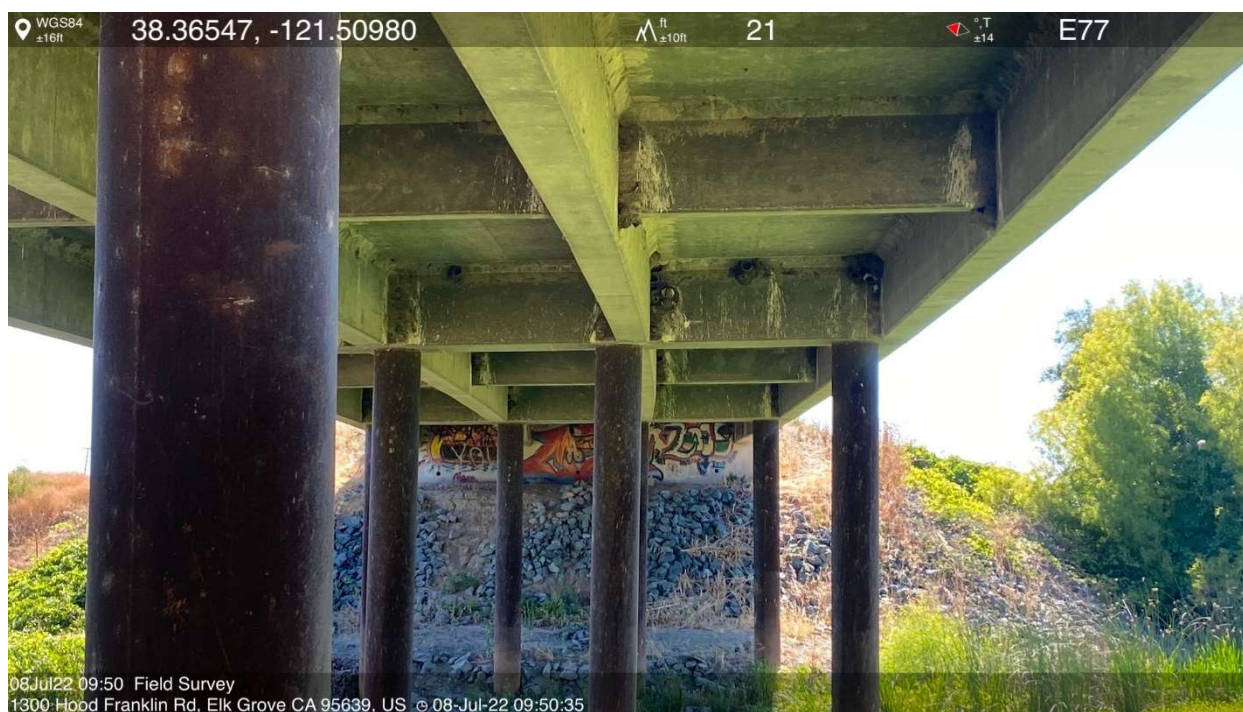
Unnamed Stone Lake Channel, Hood-Franklin Road Bridge (nesting swallows)
